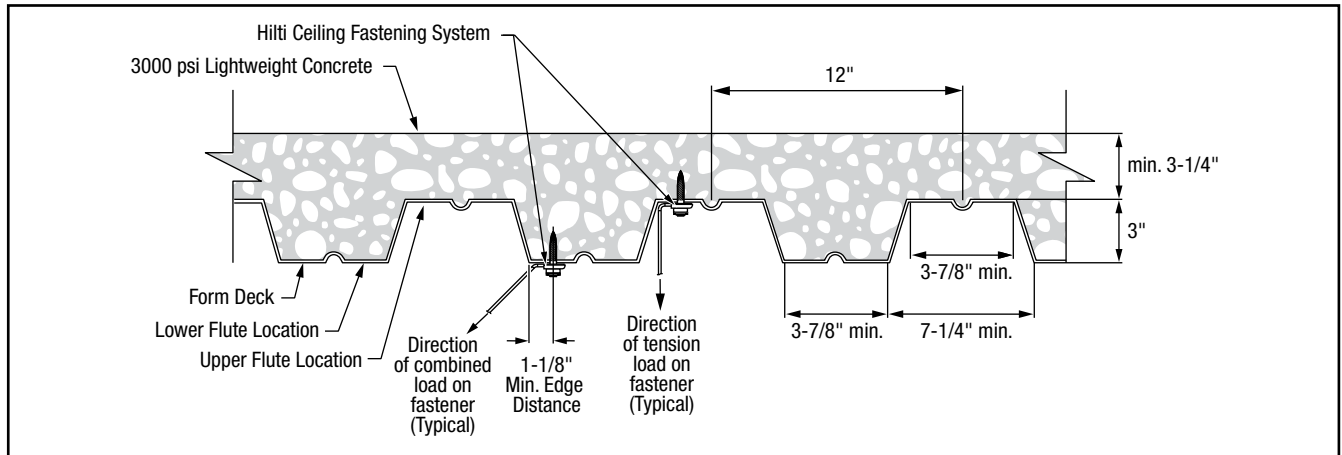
Hilti Ceiling Fastening System Location in 3-in.-Deep Composite Floor Deck, Normal Deck Profile Orientation
